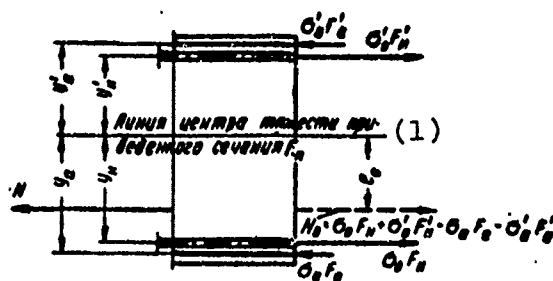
Diagram of the distribution of forces in the transverse cross section of a prestressed element when determining stresses in concrete and reinforcement .
